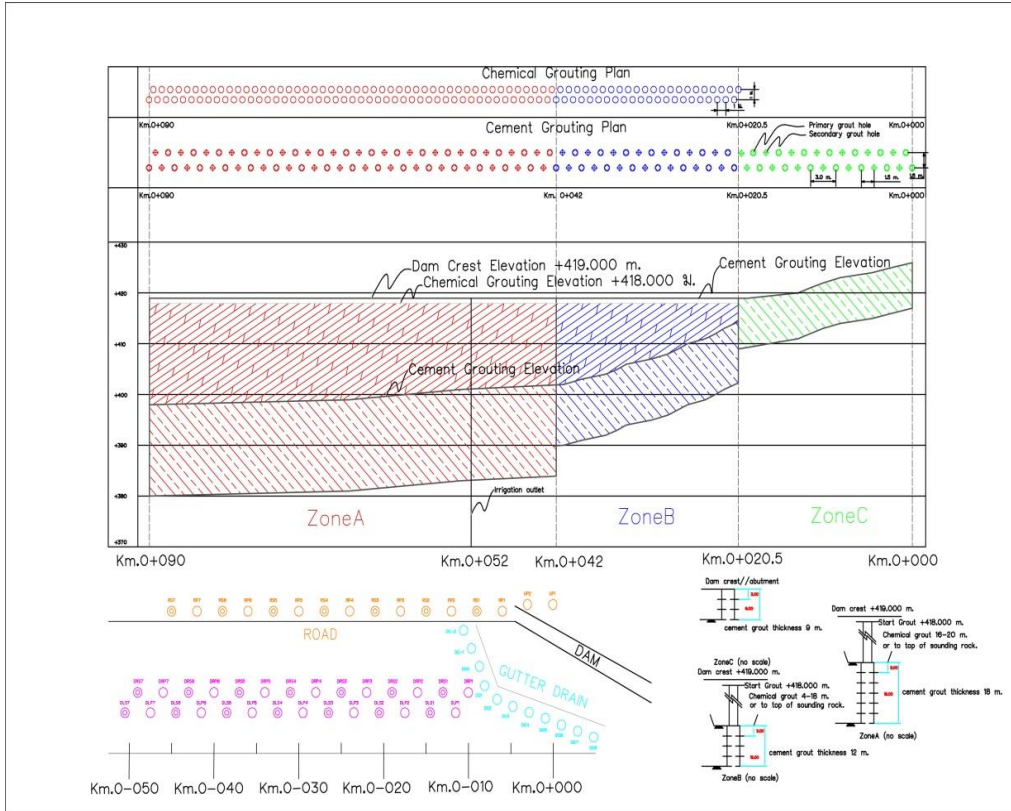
Profile of Cement and Chemical Grouting Hole Conducted for Mae Thi Dam (Modified from Site plan No. RID1.GEOL. 153/2013)
